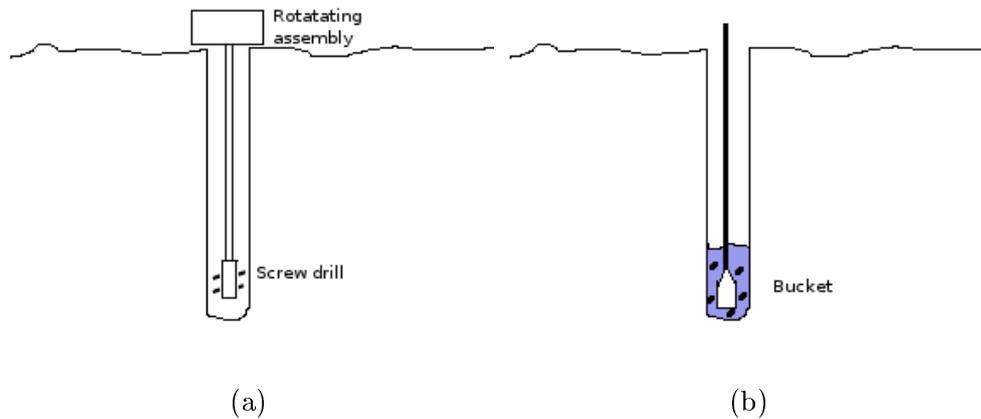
Auger method consists of alternatively drilling with a screw and removing cuttings with a bucket. The bucket has a flap on the bottom that opens up when it hits the water. As the bucket is filled, the flap closes and the bucket can be pulled out.
